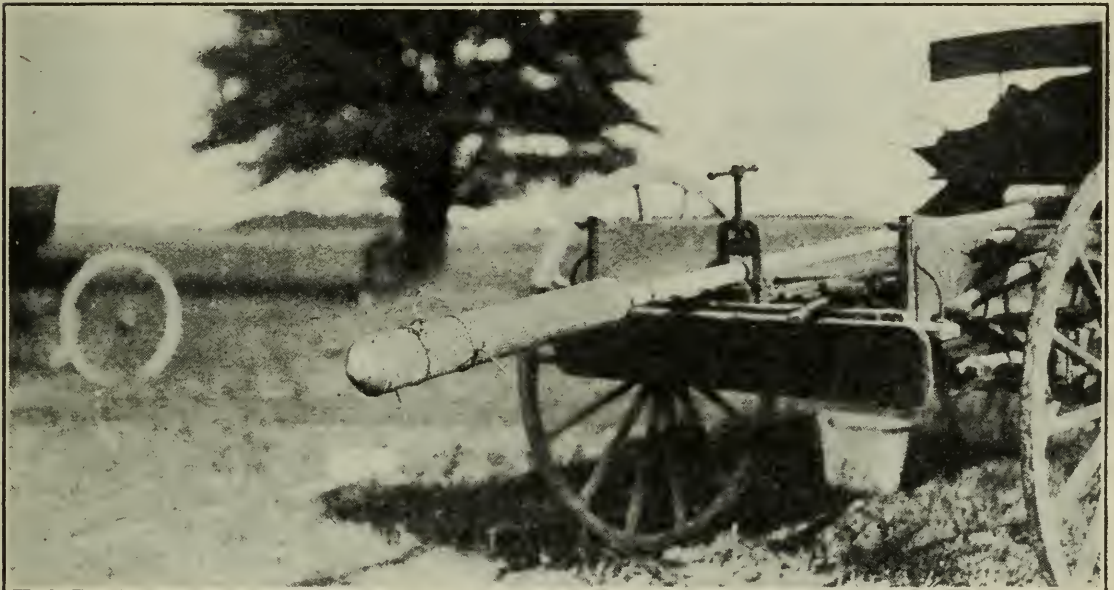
(b) Sand filter, to be placed in open drive pipe.
